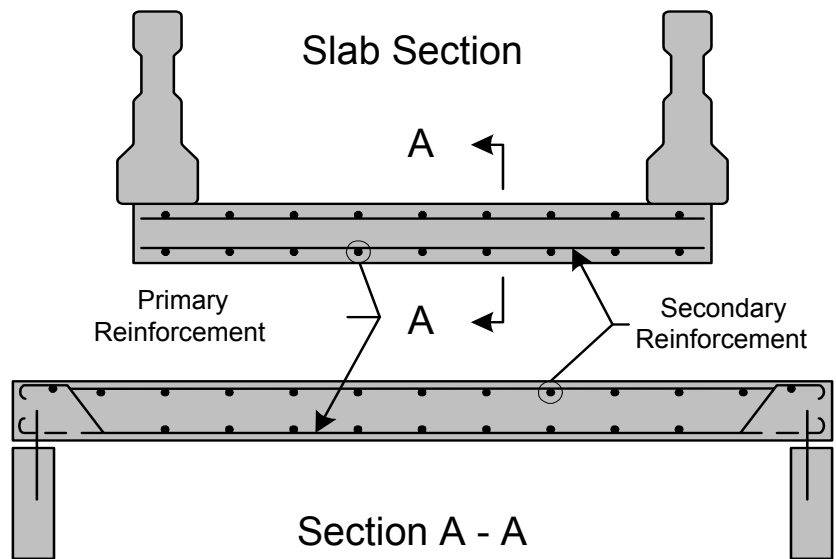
Steel Reinforcement in a Concrete Slab
